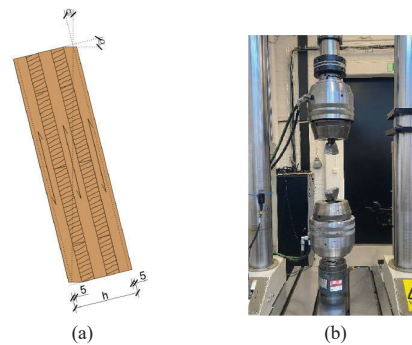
Test configuration of the rolling shear test: Set up of the inclined specimen (a), universal testing machine for the rolling shear test (b).
